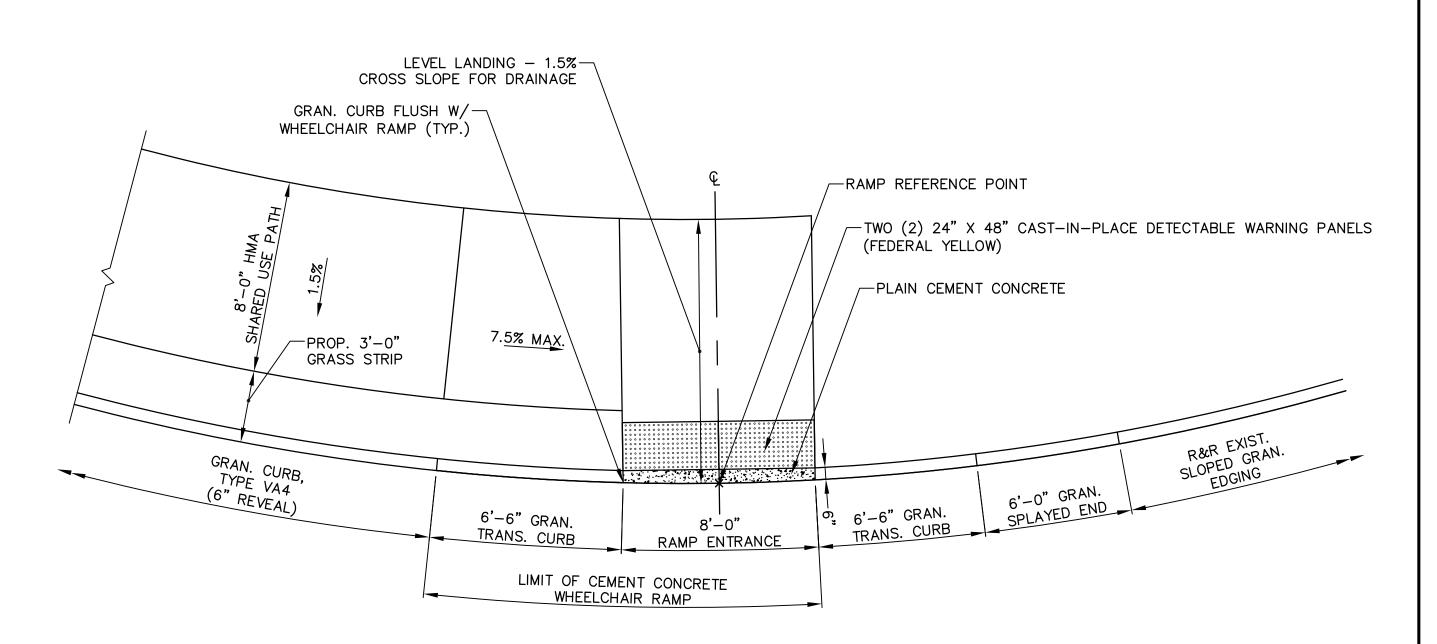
DETAIL FOR WHEELCHAIR RAMPS #9 & 16
